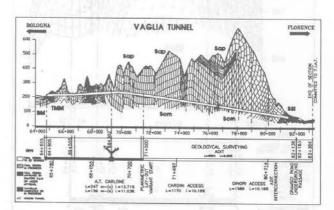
"Vaglia" tunnel: longitudinal geological section.
